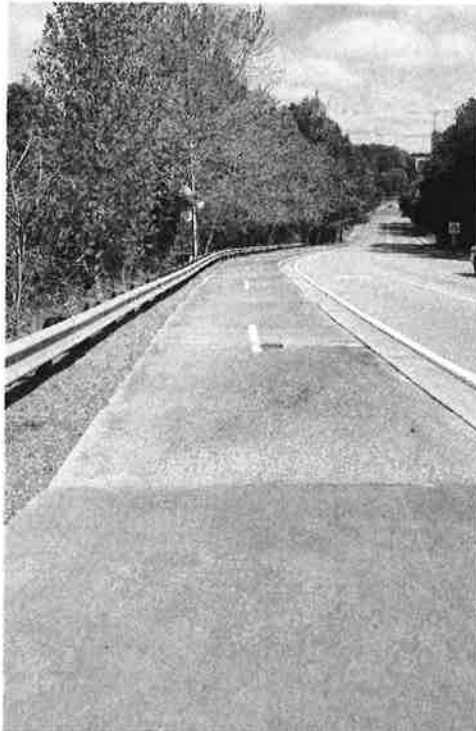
Silver Comet Cumberland Connector- View of existing trail at Mt. Wilkinson Parkway where proposed express lanes are to be constructed under the trail. Photographer facing west.
